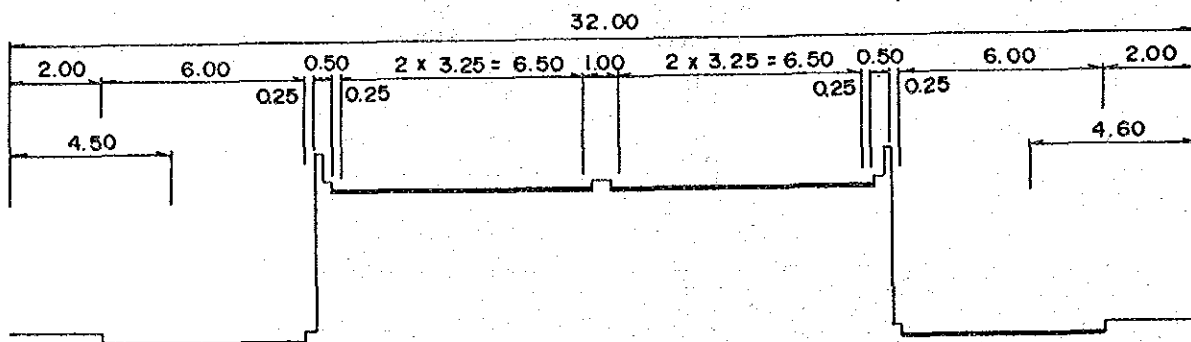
TYPICAL CROSS SECTION AT THE END OF VIADUCT
